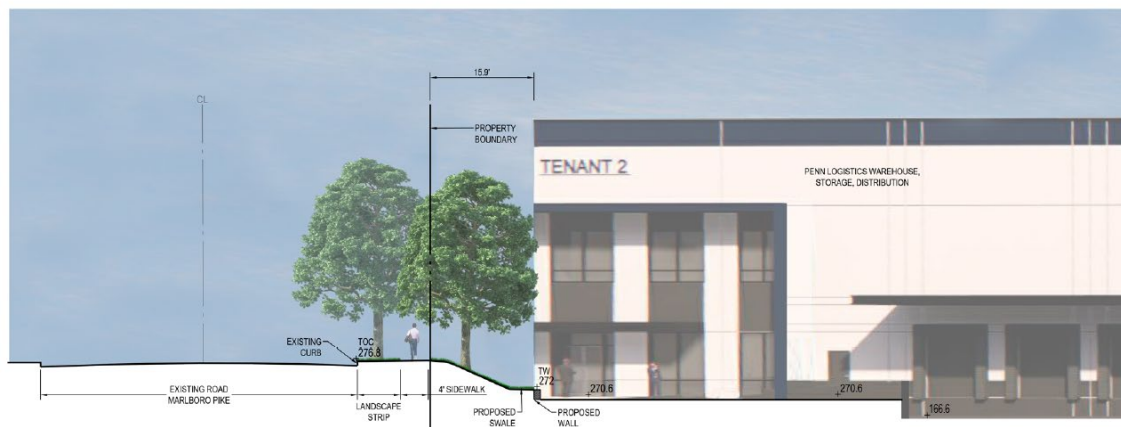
Cross-Section of the Street frontage of Marlboro Pike
